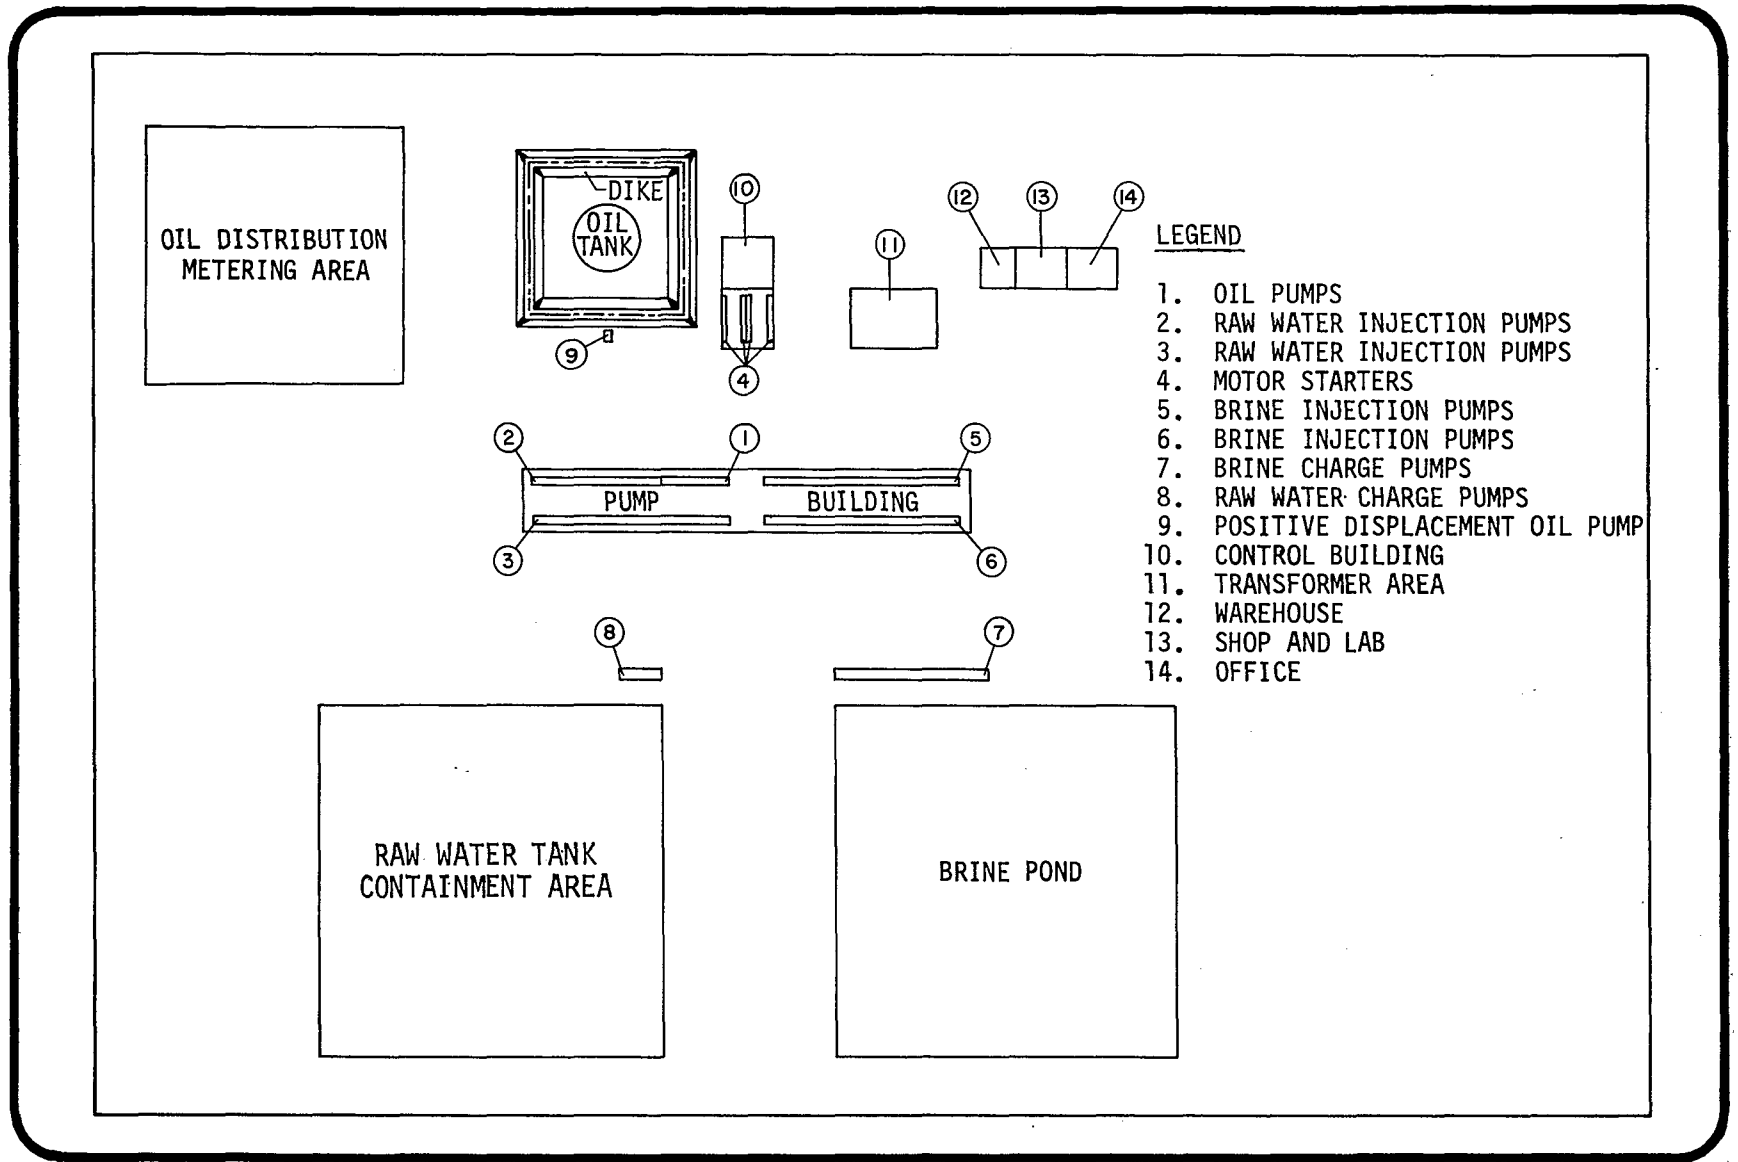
Storage area layout - Chacahoula dome.
